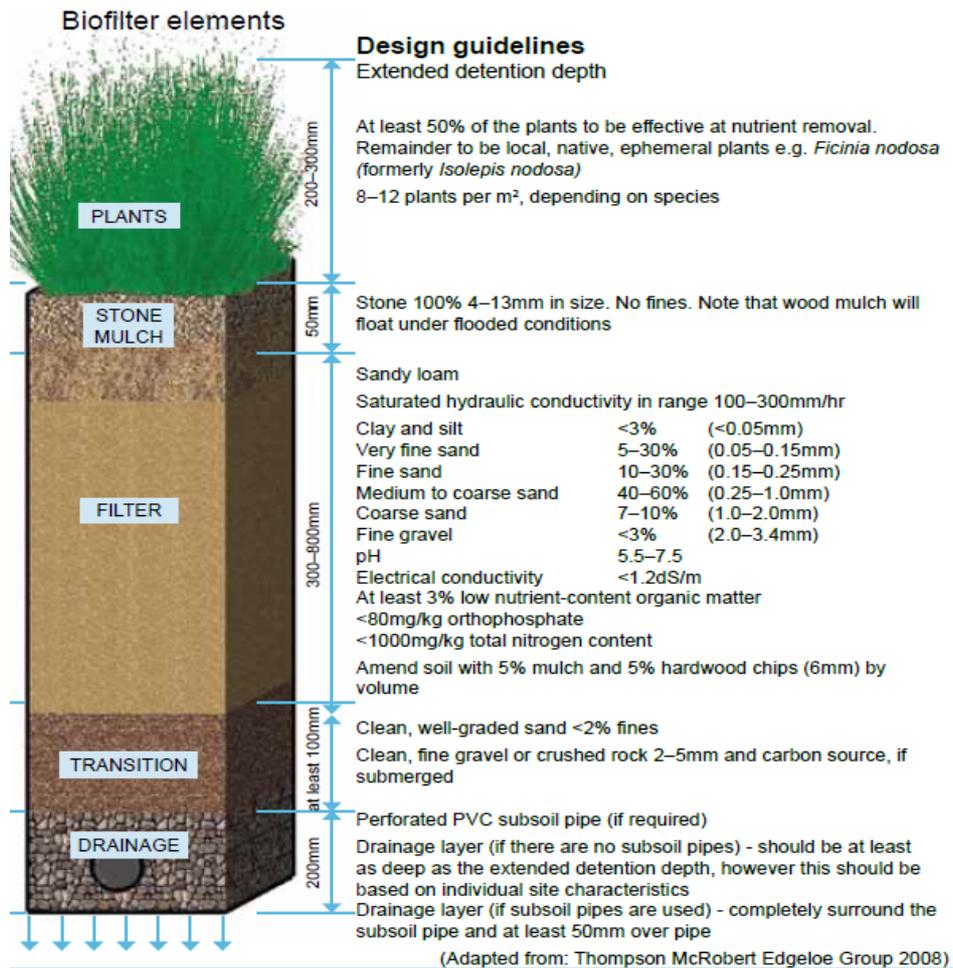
13 – Typical cross-section – Biofilter or Rain garden
